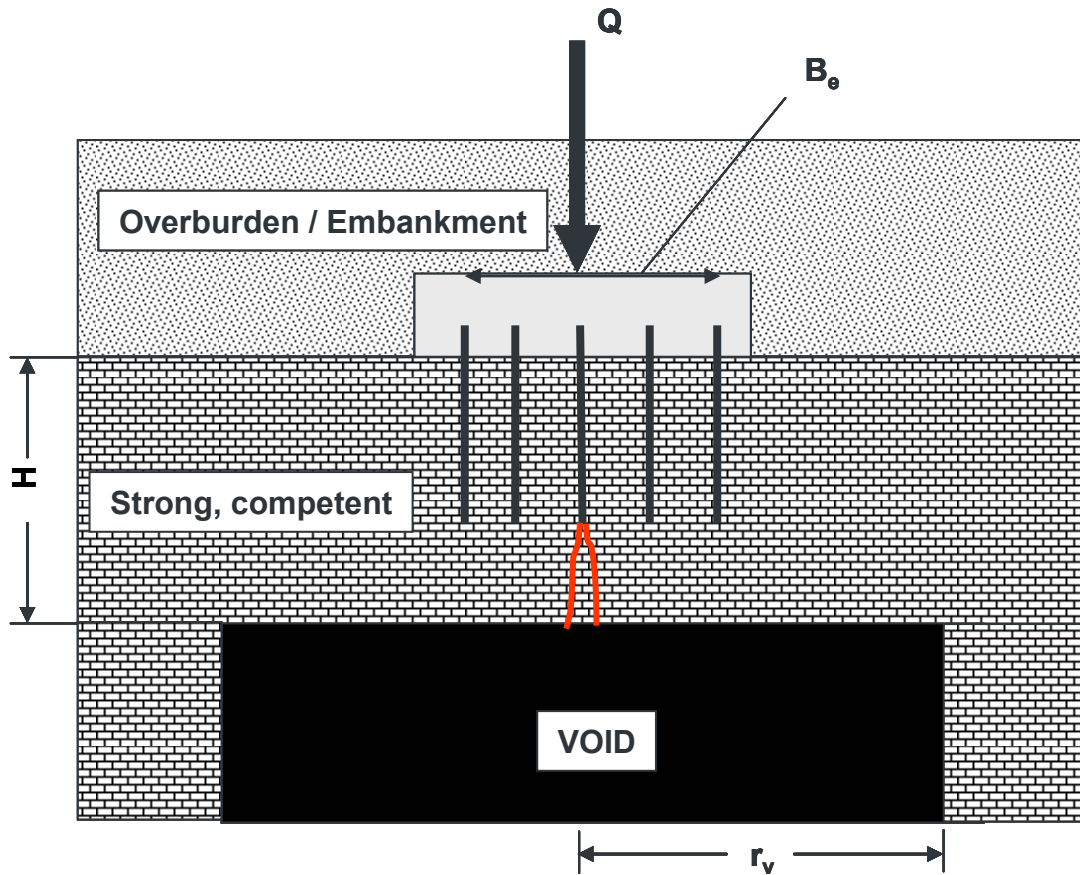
Finite Element Analyses – Roof Stability over Void with Foundation and Embankment Load
